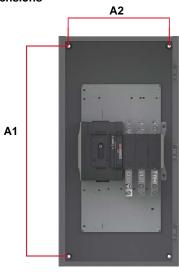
Automatic transfer switches, Mounting hole dimensions, refer to Table 9.2 for A1 and A2 values
